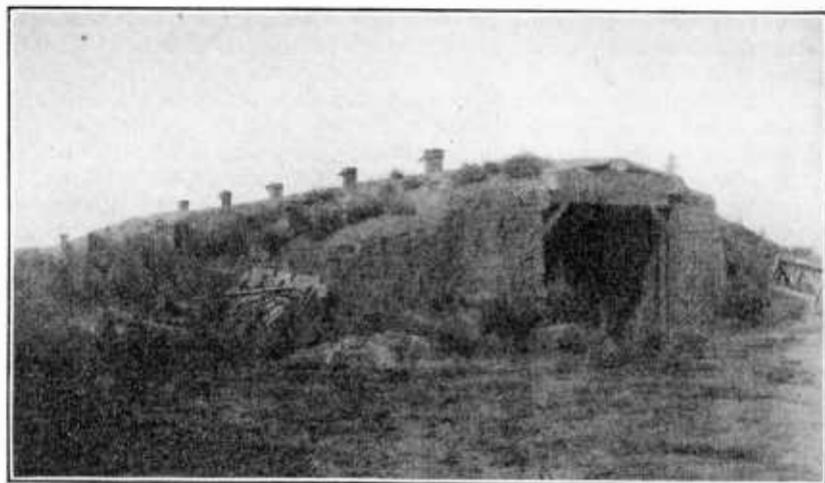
A potato storage house with walls of sod, adapted only to dry sections.
